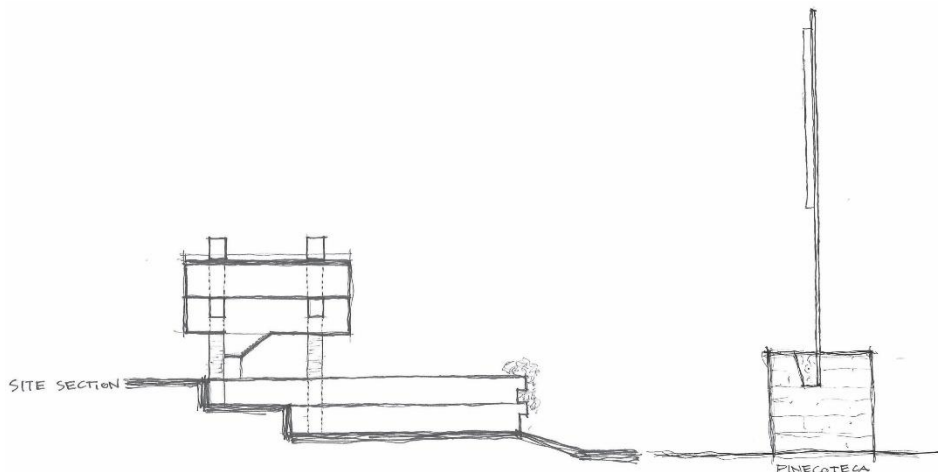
Lina Bo Bardi, site section and easel drawing, MASP, São Paulo Brazil, 1957 - 1968. Drawings by author.
